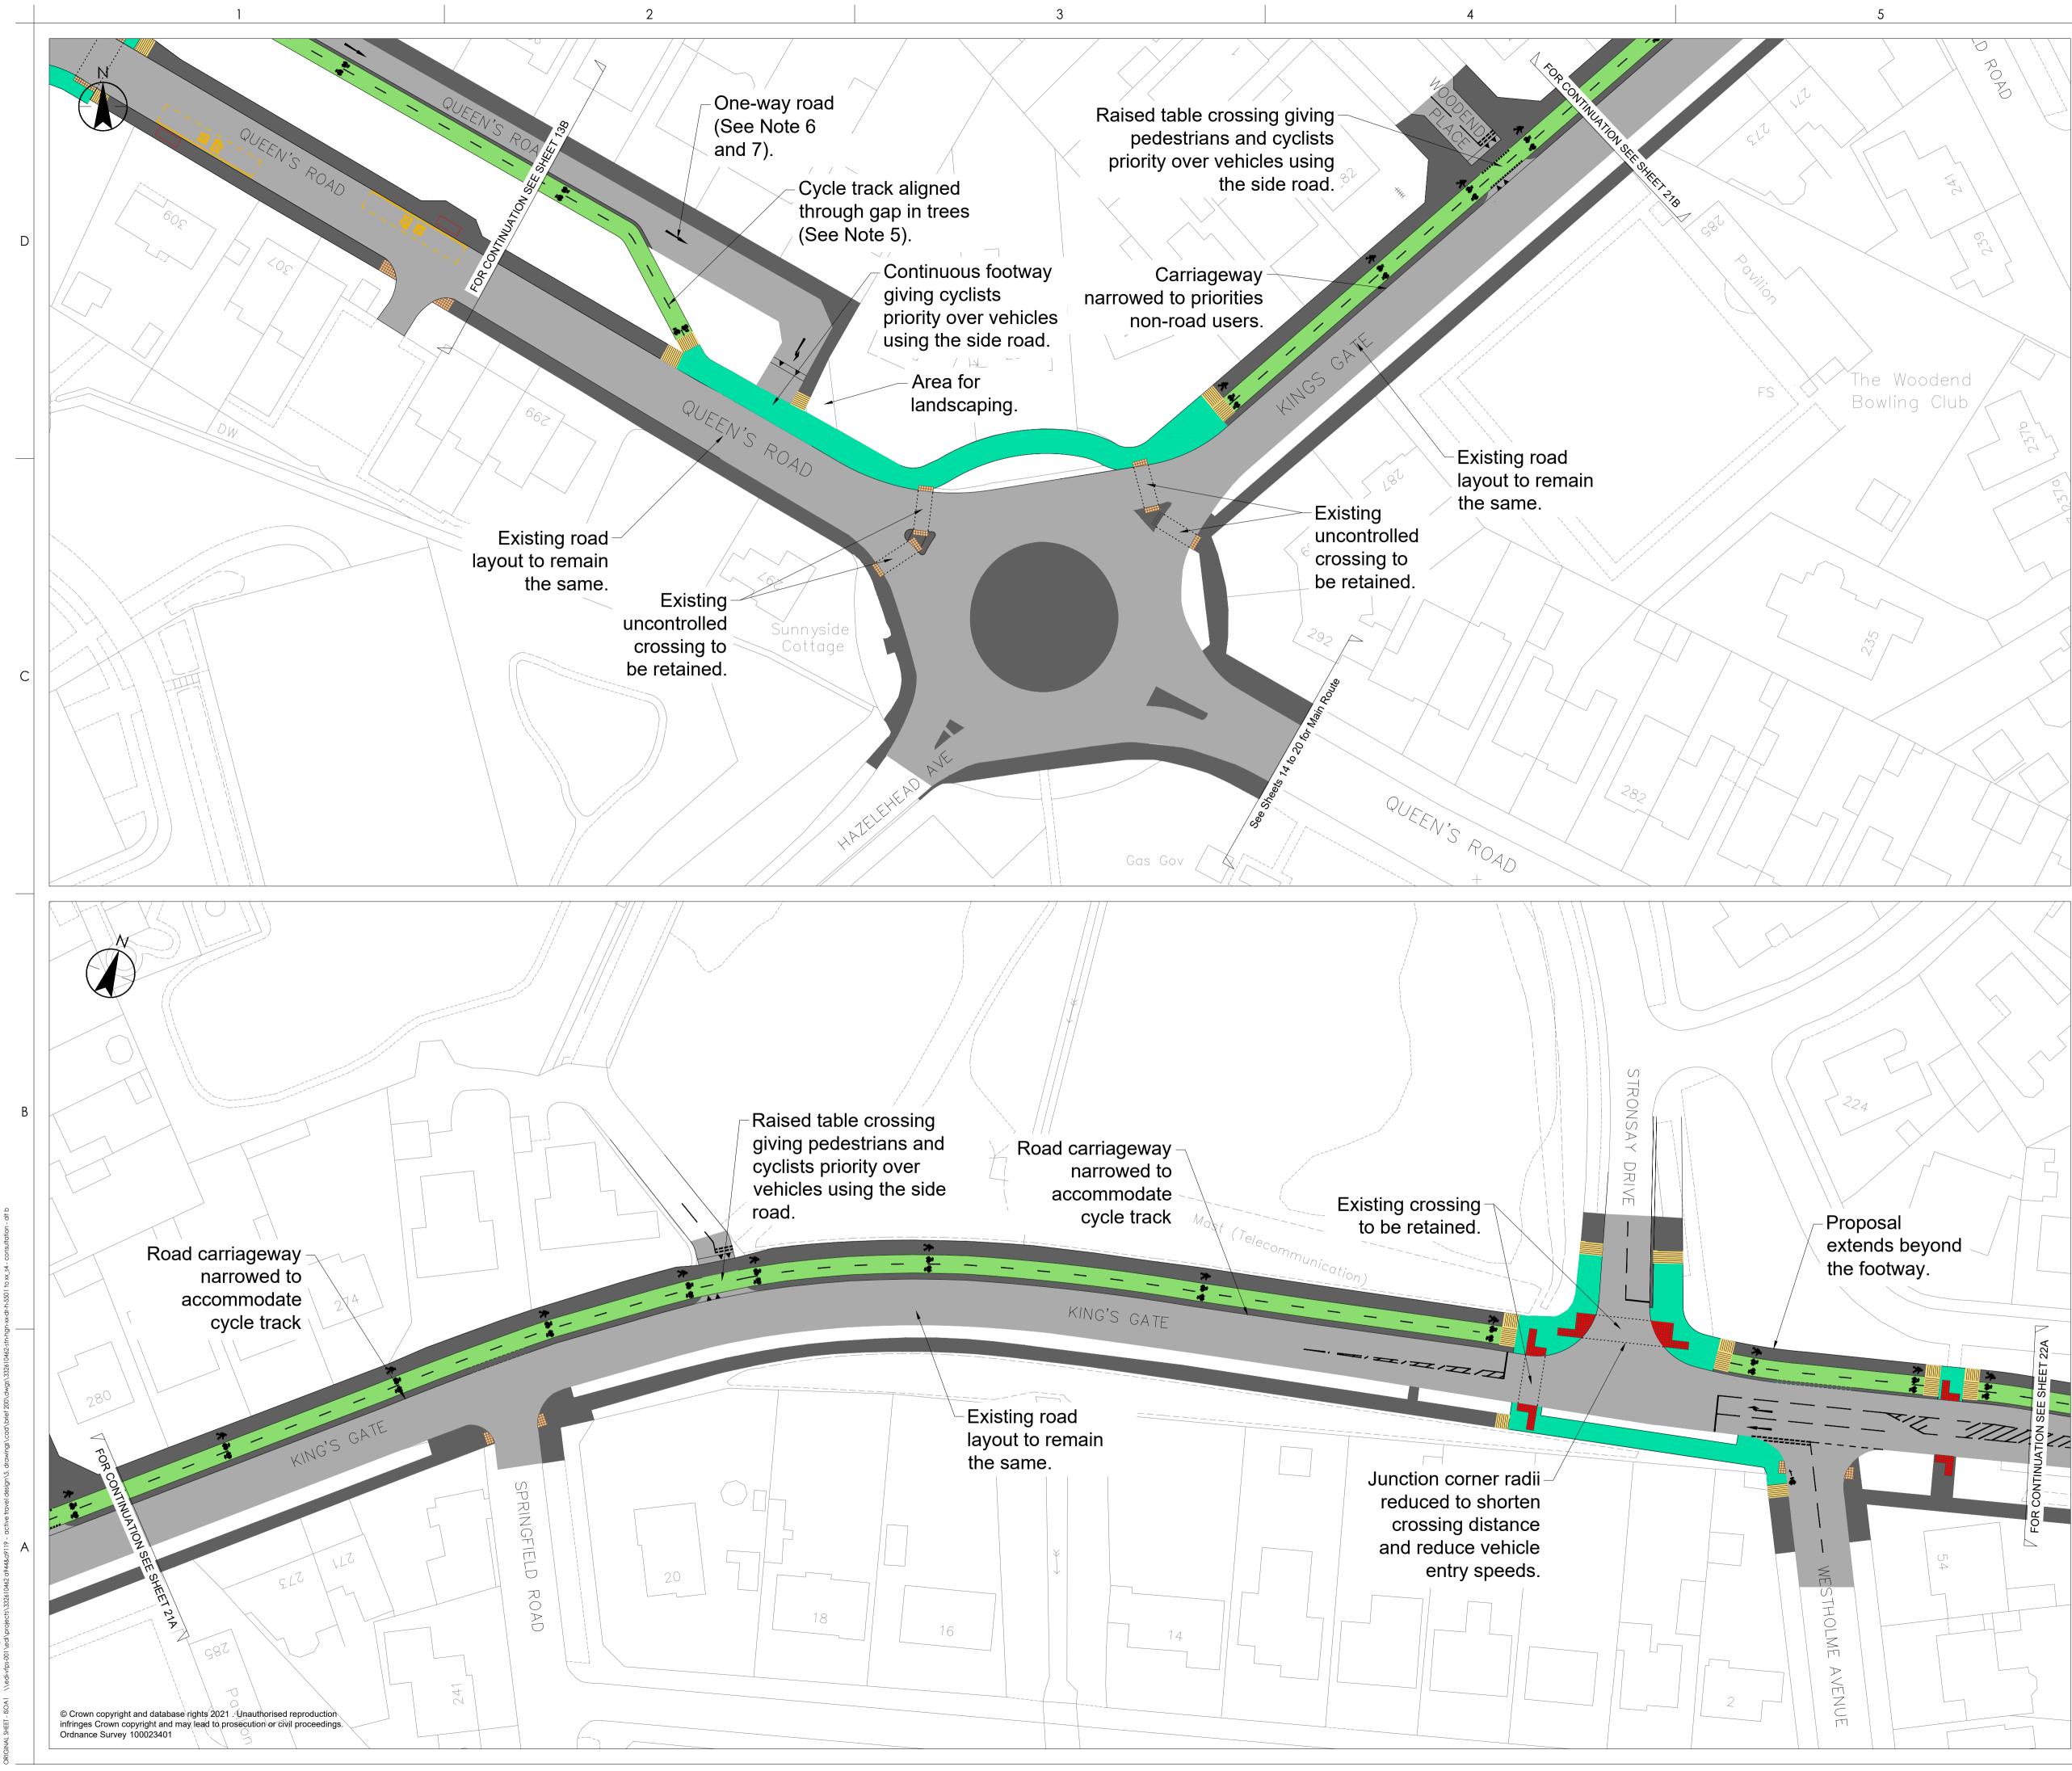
STN-HGN-XX-DR-H-5525
